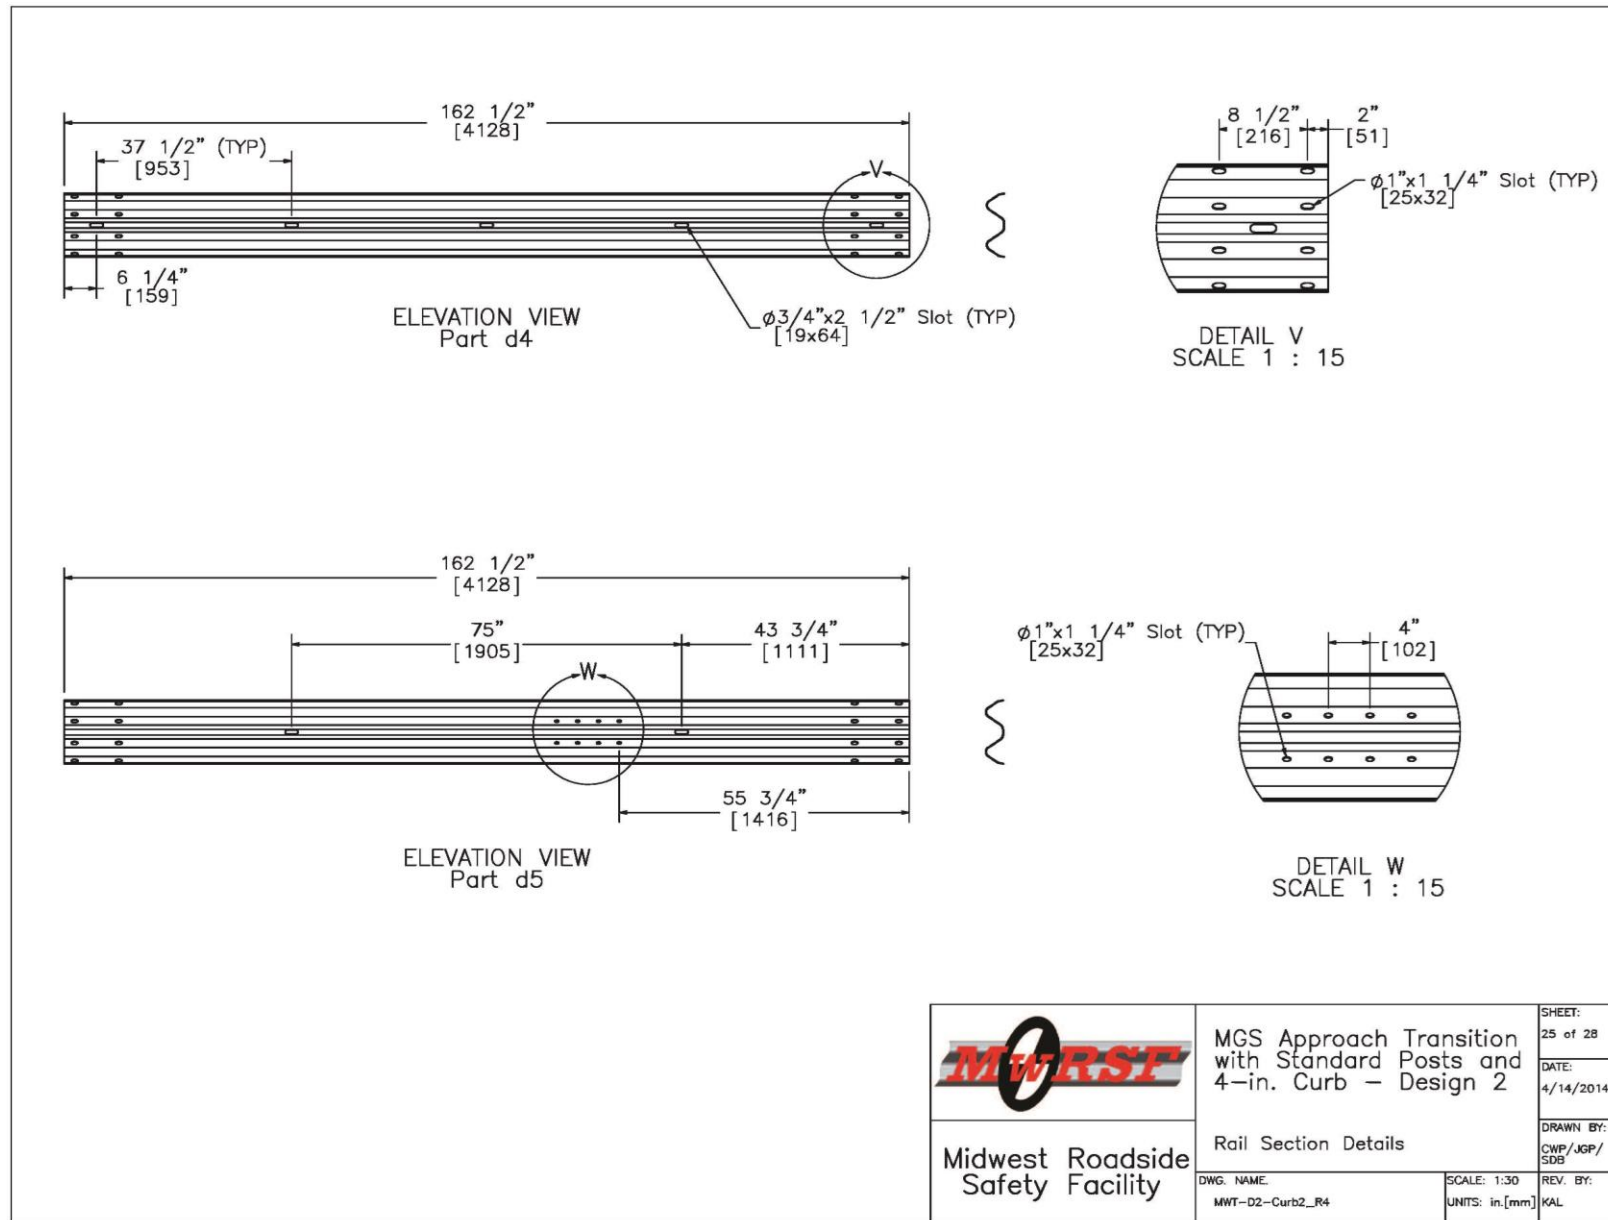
Rail Section Details, Test Nos. MWTC-2 and MWTC-3
